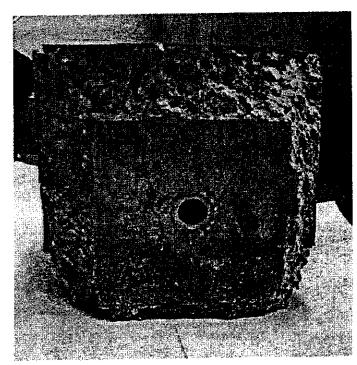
Picture Showing Spalling of Concrete at Edges
